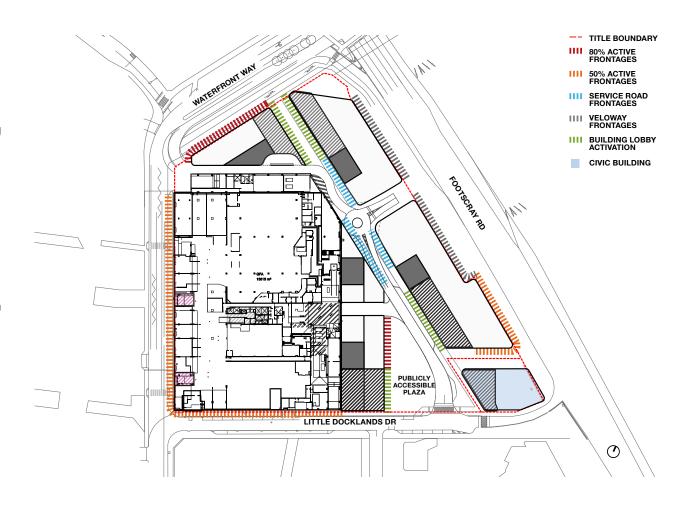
Concept Plan 3 - Ground Floor Public Realm Activation
